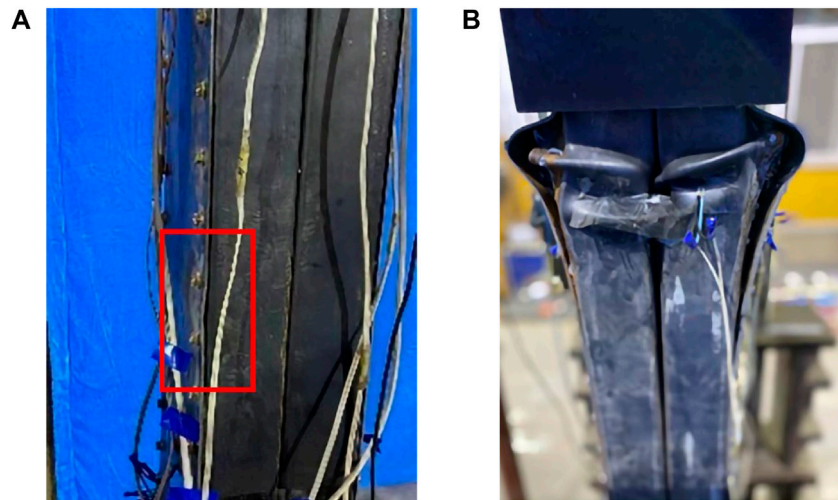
| (A) Local deformation of specimen steel plate of SR50-2.2. (B) Specimen buckling of SR50-2.2.
